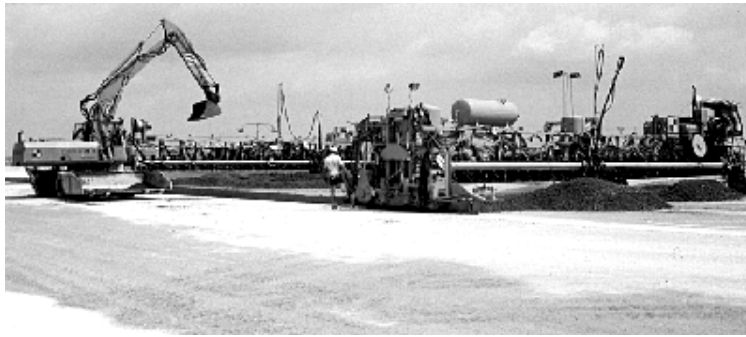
Construction of the concrete pavement for the runway in two layers in slipform technology, placement width 15 m; here construction of the first strip as a “pilot strip” with sinusoidal longitudinal construction joints (see Fig. 5)
